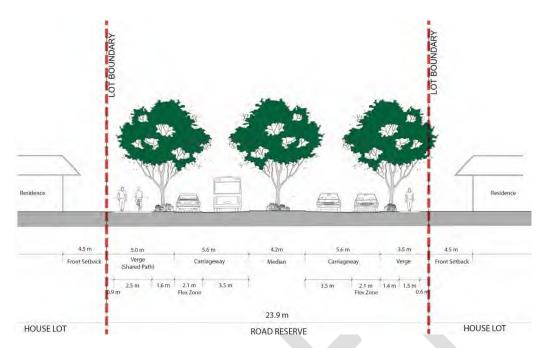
Collector Road Cross Section – Median (Typical)
